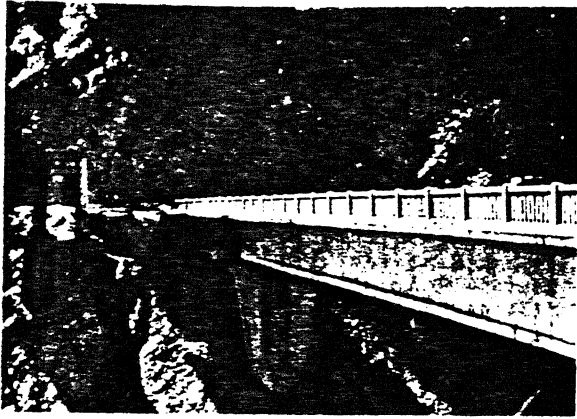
A View of the Legship Bazar Bridge, Sikkim.
